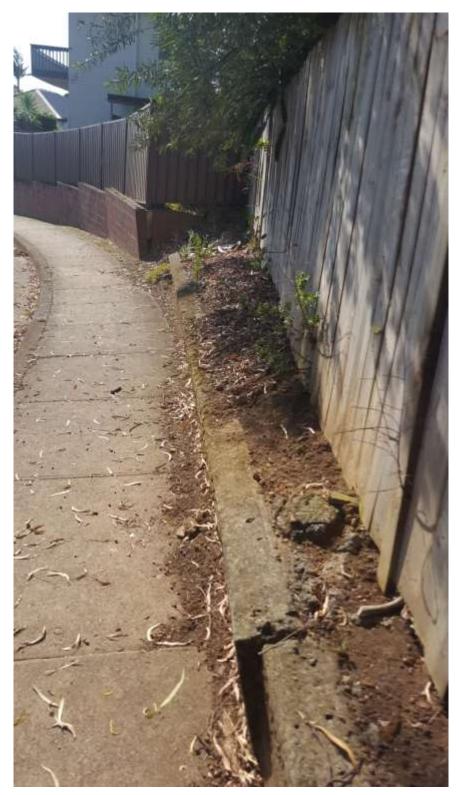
The land to be reclassified is the narrow strip of land between the retaining wall and fence and also includes a portion of land behind the red brick retaining wall
